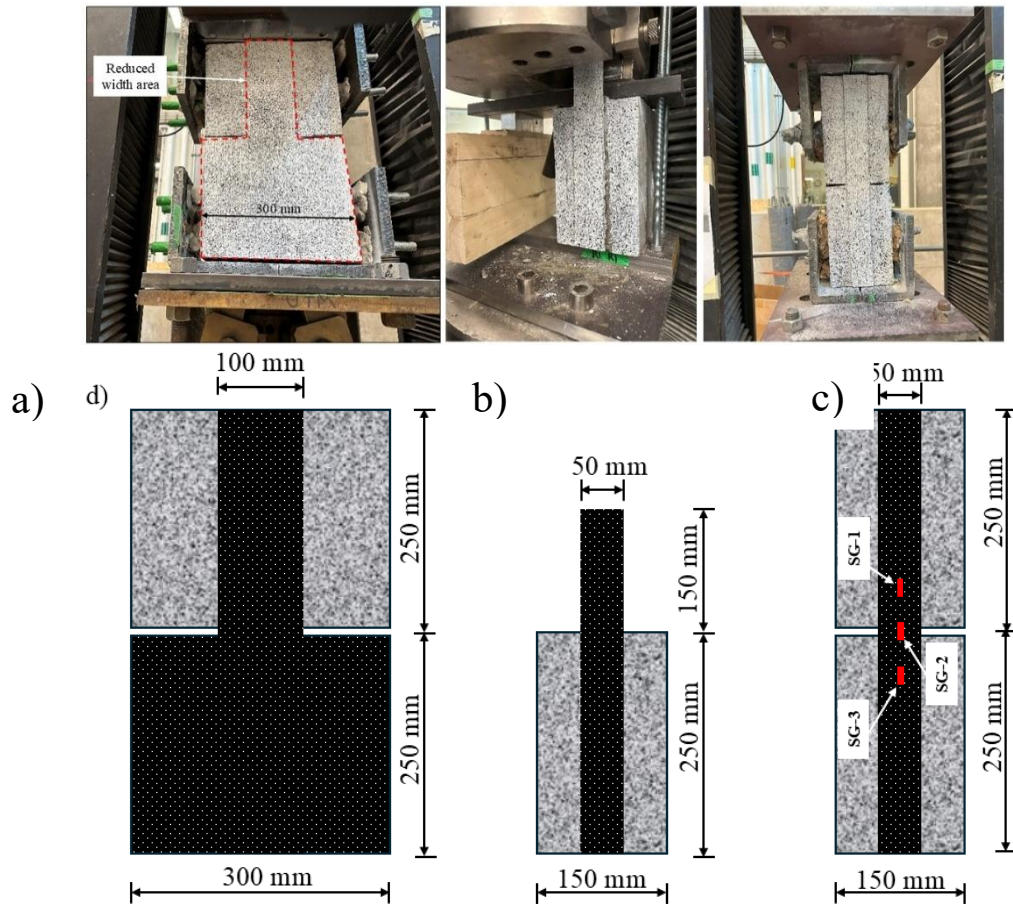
Shear-lap tests in progress and specimen dimensions a) New single shear-lap b) Conventional single shear-lap c) Double shear-lap d) specimen dimensions
